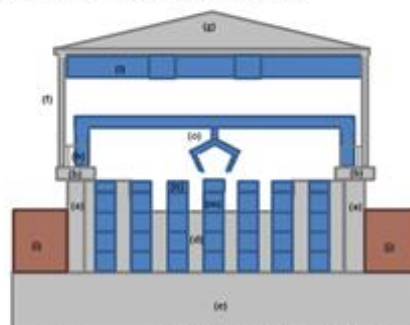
UOS cross section (looking West, with East Shield walls removed)
